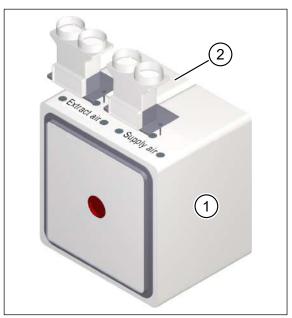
Installation kit M-WRG-M/MB-FR75/2 with optional filler piece M-WRG-M/Fü
